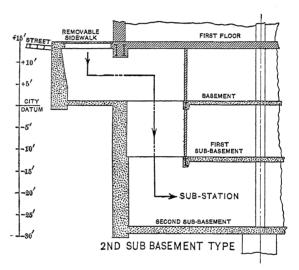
Sectional Elevation, Second Sub-Basement Type
